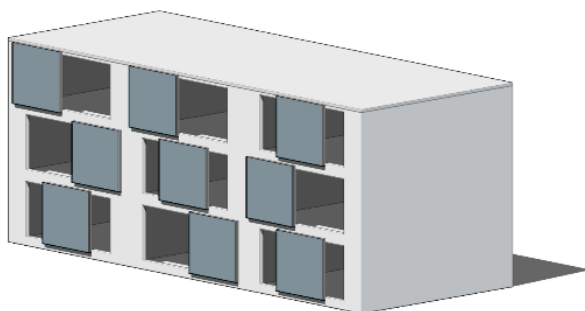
Application of the composite Trombe wall on the test design. Author's work (2025)
